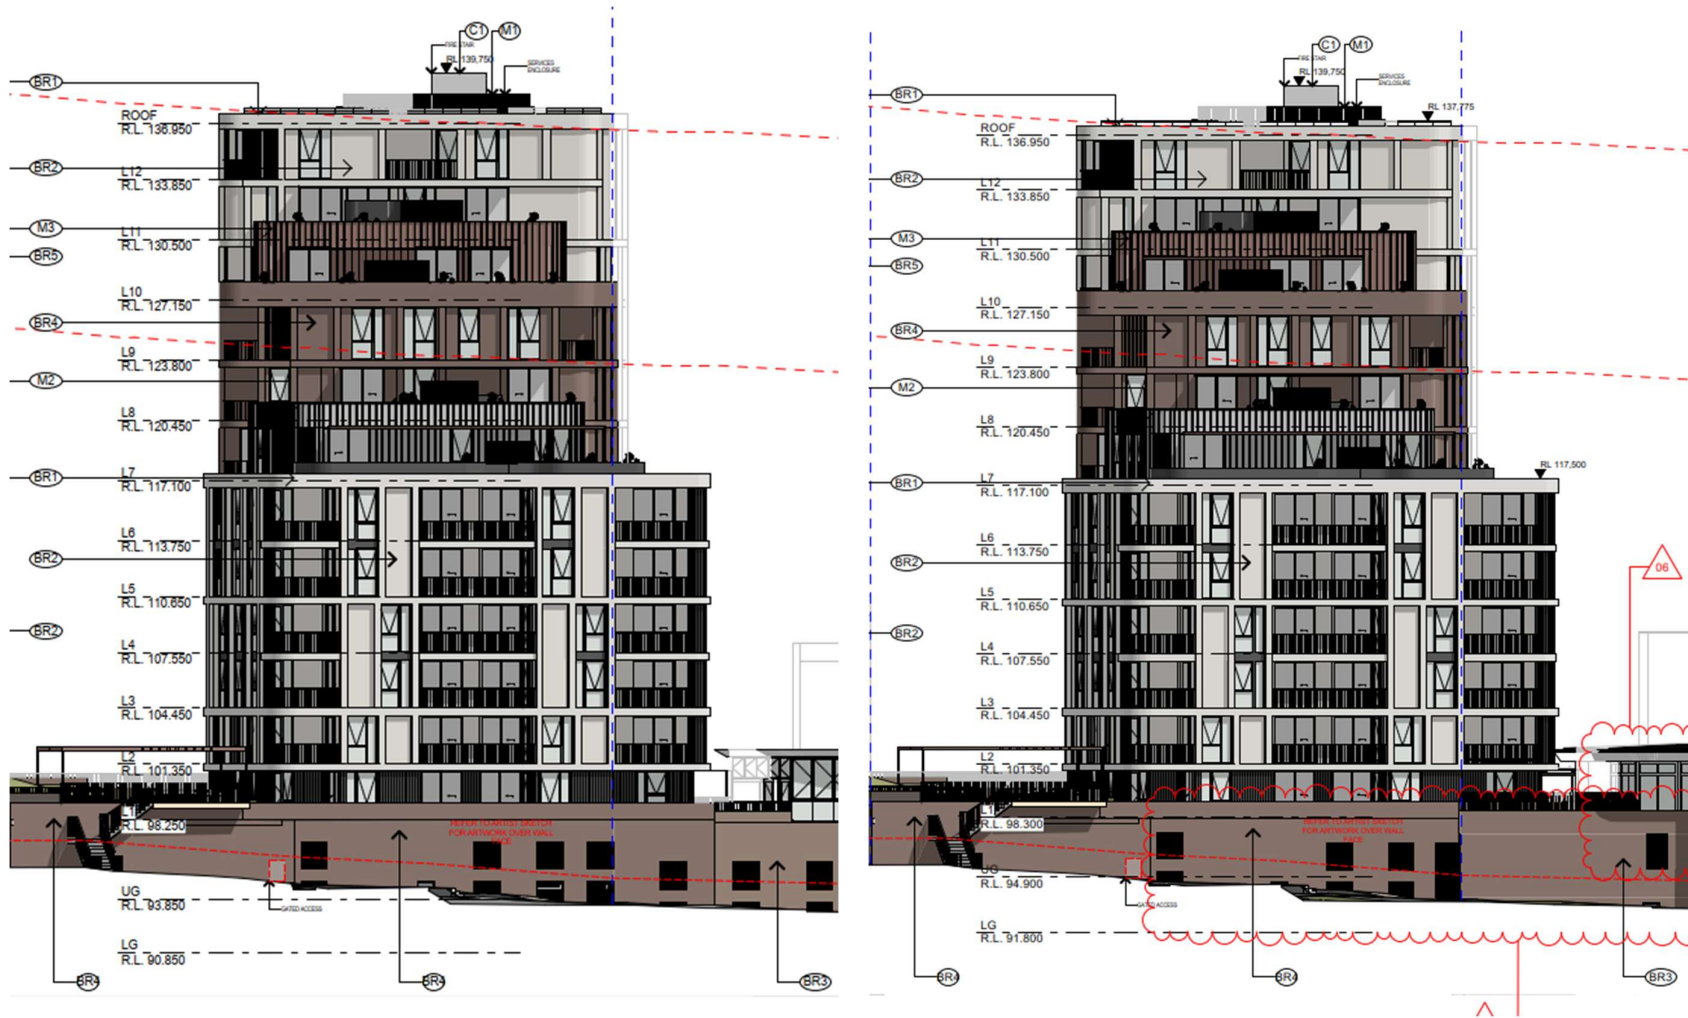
Approved and Proposed Building-C South Elevation Tiral Street (2 of 4)
